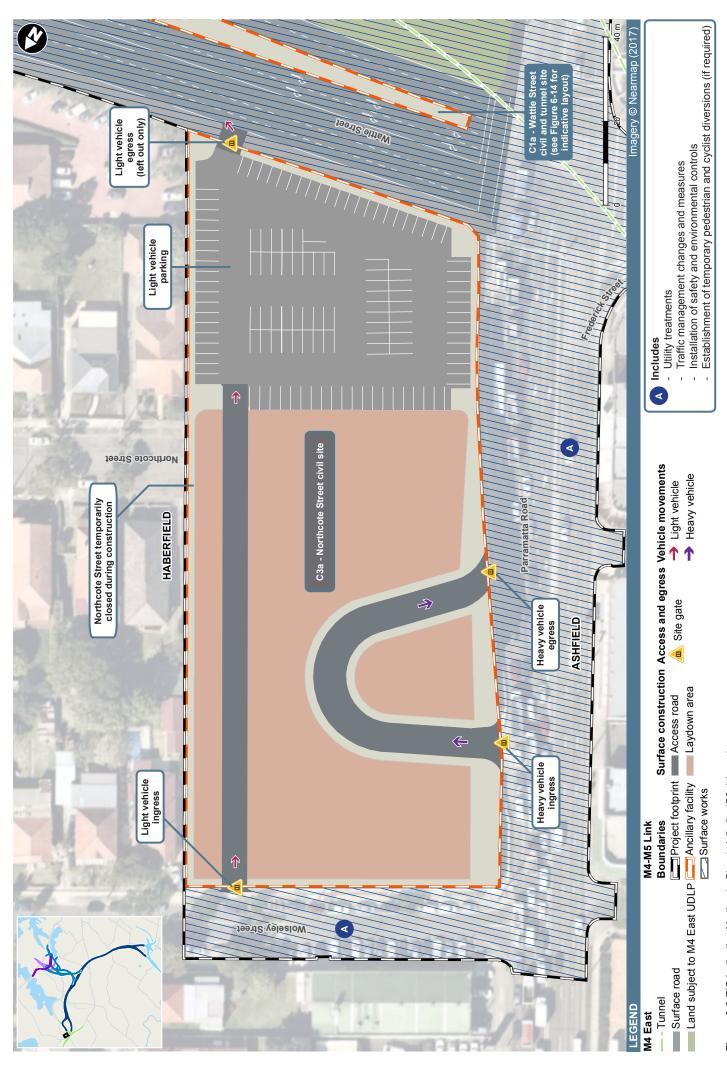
EIS Indicative Northcote Street civil site (C3a) layout
